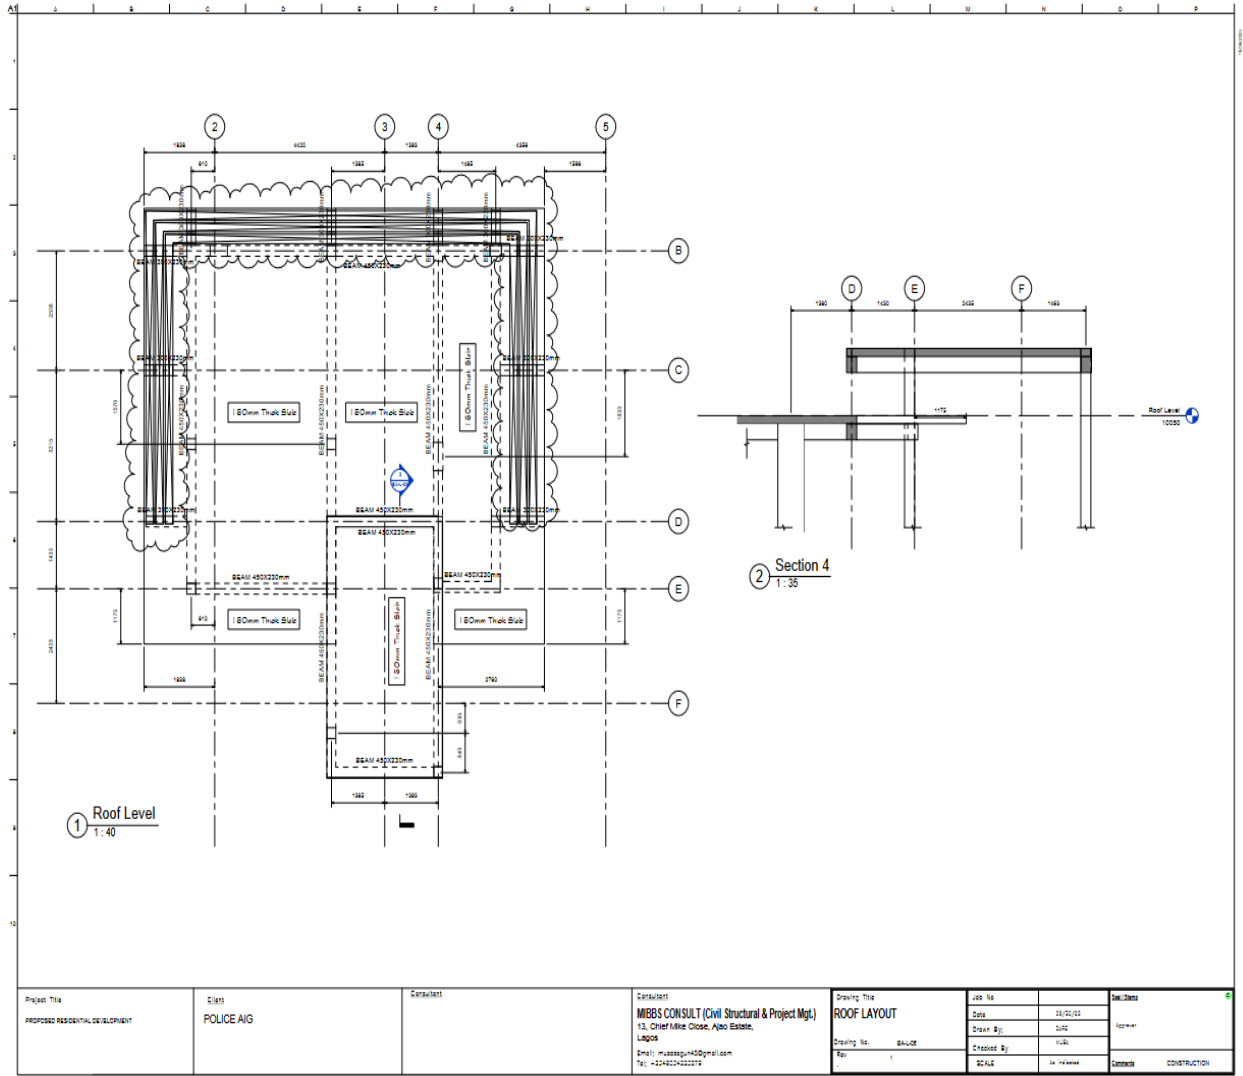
STRUCTURAL PENT FLOOR OF THE INVESTIGATED BUILDING
